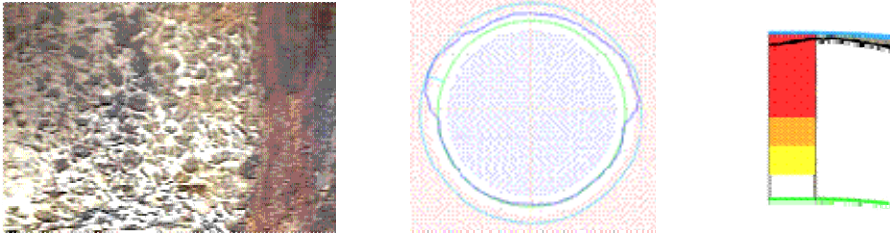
Laser profiling image above shows corrosion to 41 mm on original pipe wall (Atlas Inspection Technologies, Inc. 2010).
